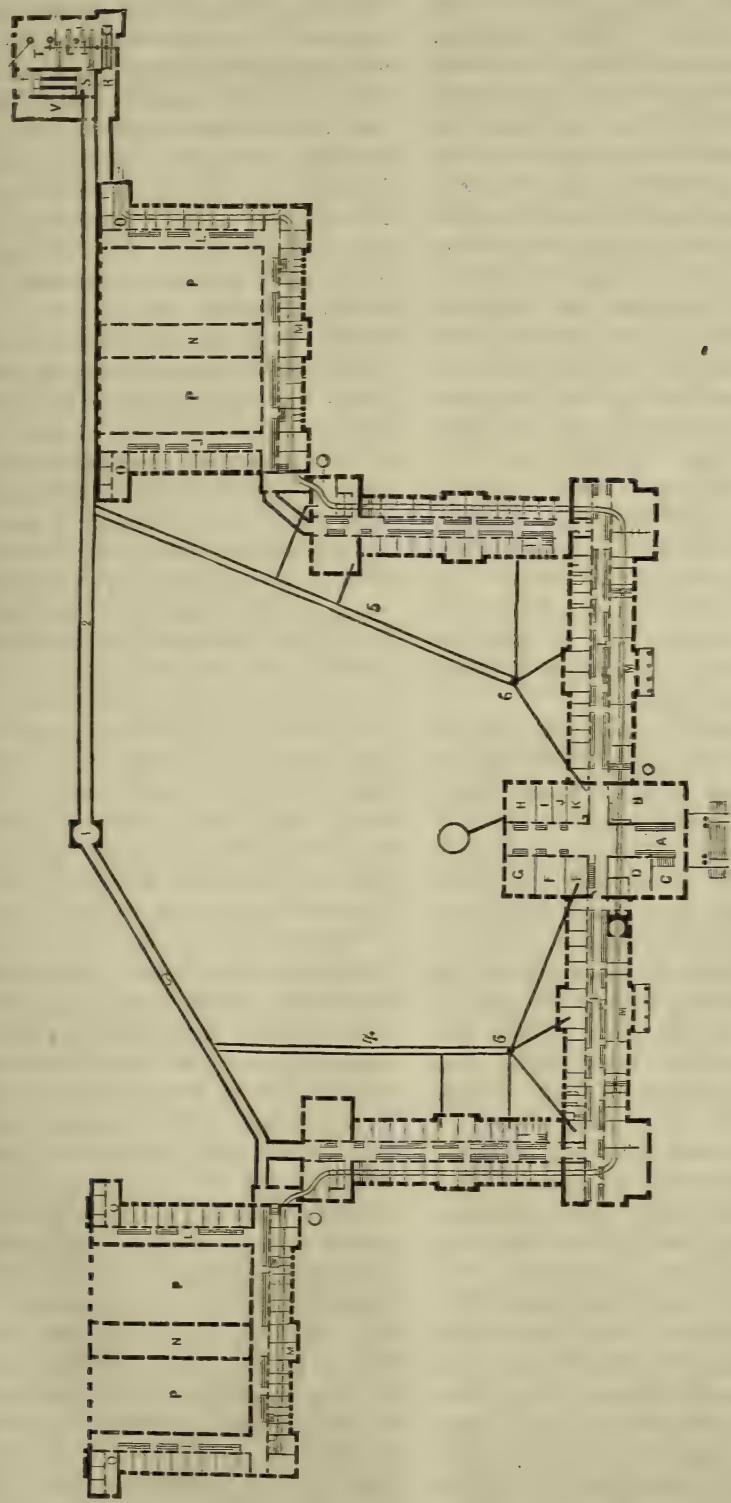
PLAN FOR THE SYSTEM OF HEATING AND VENTILATION
